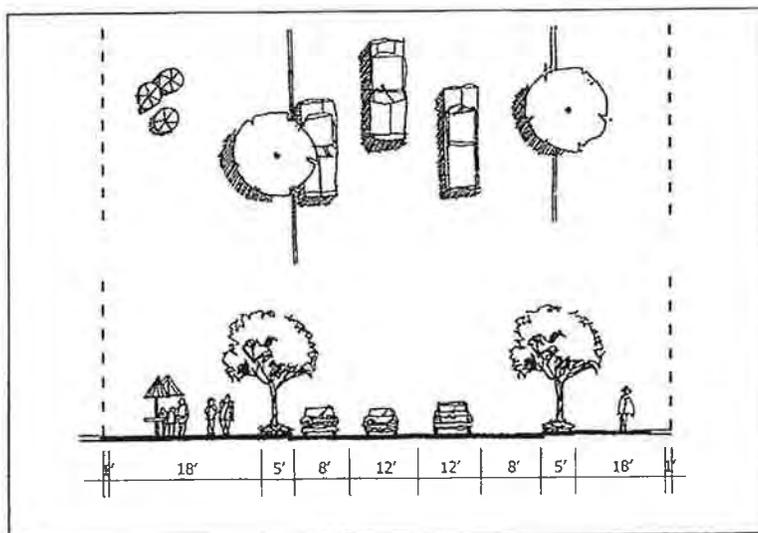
PROMENADE STREET PLAN AND SECTION
